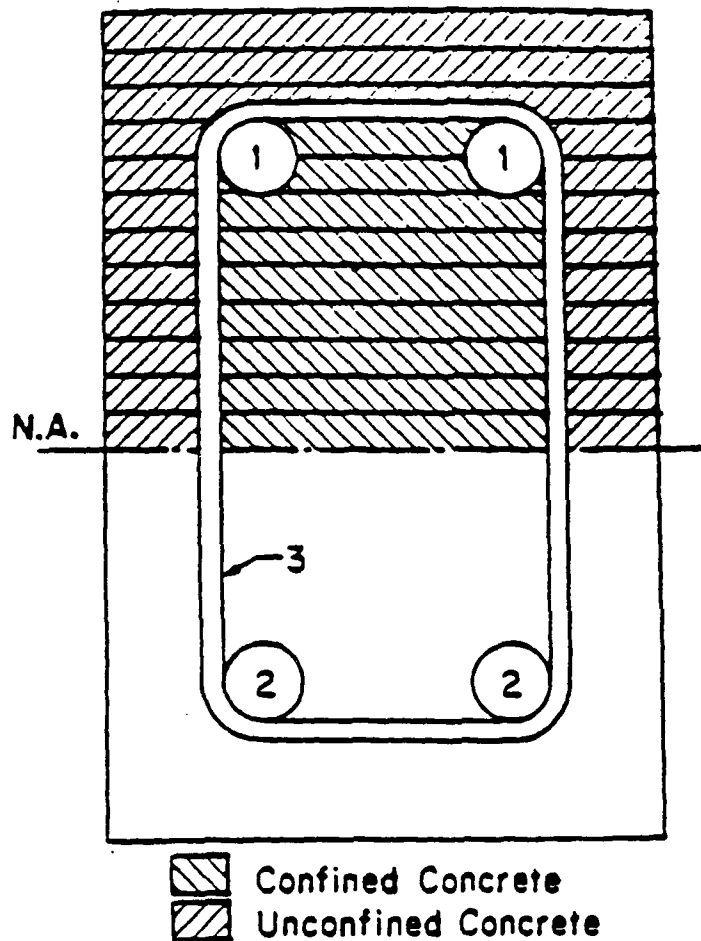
Reinforced Concrete Beam Cross Section and Division of Concrete Area in Compression
